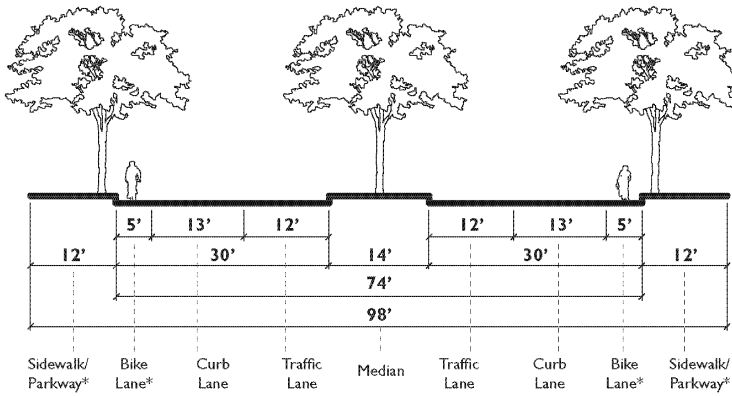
(2 of 2): CITY OF CHINO GENERAL PLAN ROADWAY CROSS-SECTIONS
